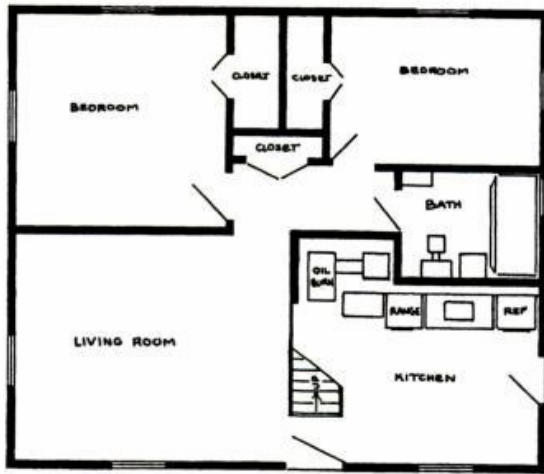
(a), Typical Levittown Cape Cod floor plan offered in 1947
